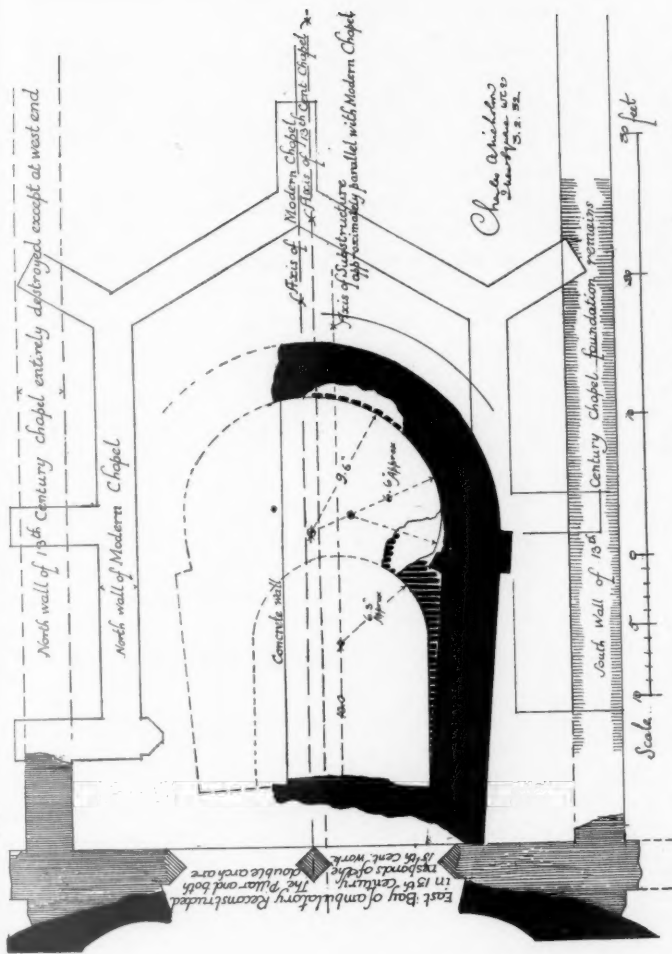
Norwich Cathedral: plan of foundations and substructure of eastern chapel
